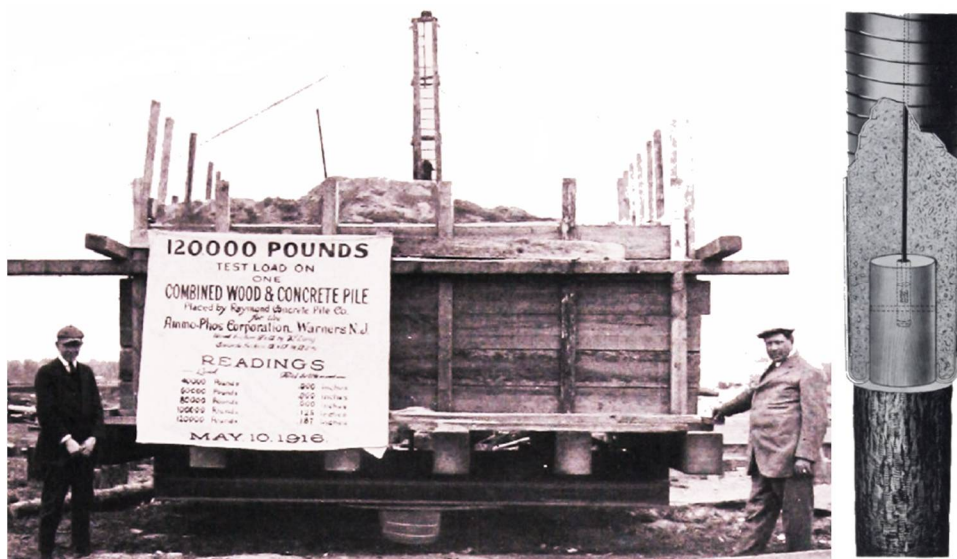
Load test on composite pile at Warners, N. J. in 1916 (Raymond concrete pile company, 1926)
